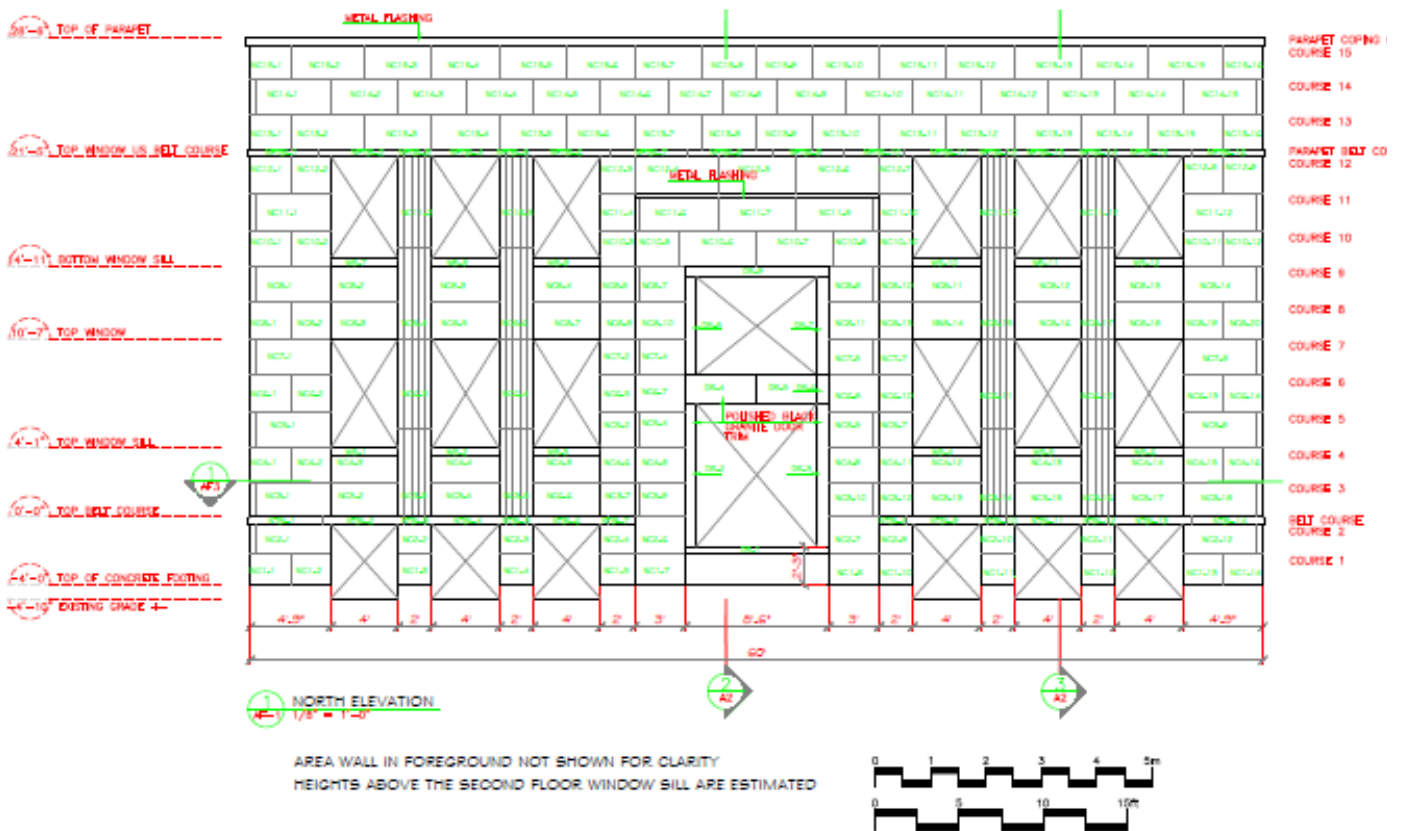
North Elevation As-Found drawing AF1 credit: Commonwealth.
